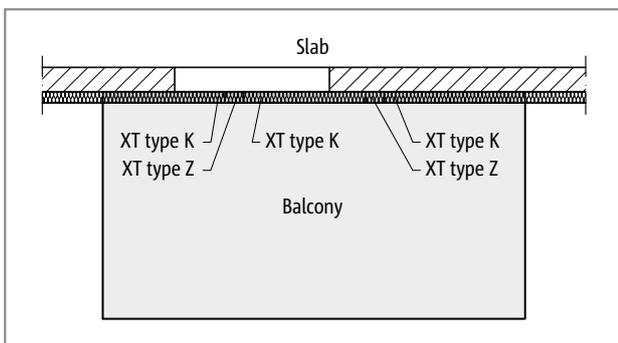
Schöck Isokorb® XT type Z, K: Balcony freely cantilevered
